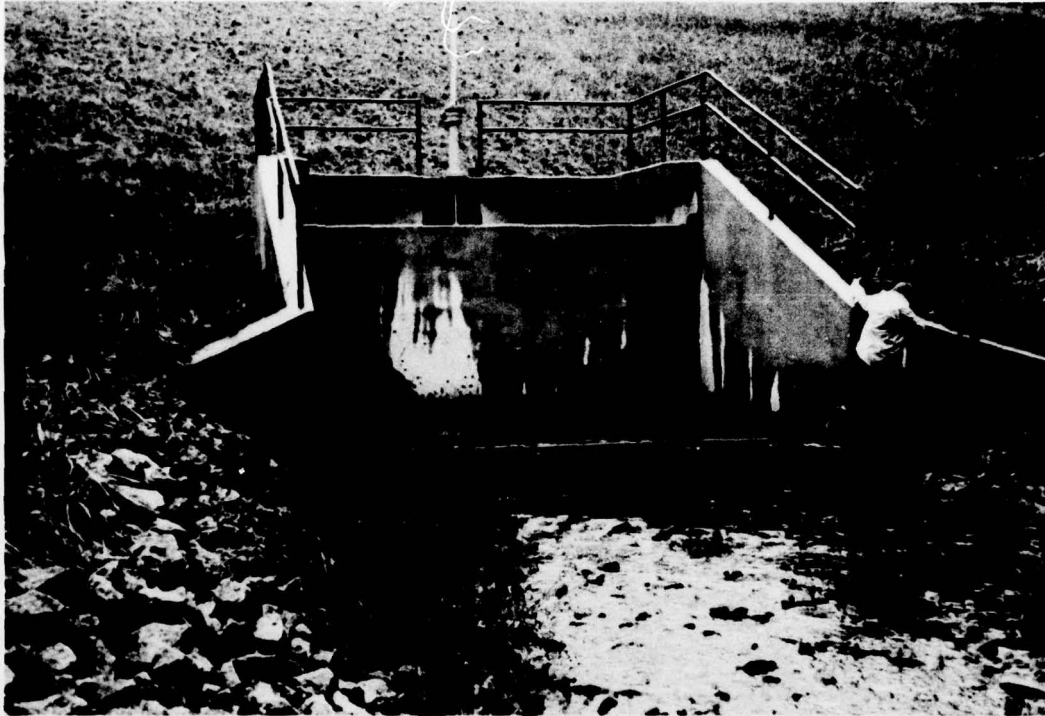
Impact Basin Showing Baffle Wall, End Sill and Riprapped Exit Channel
